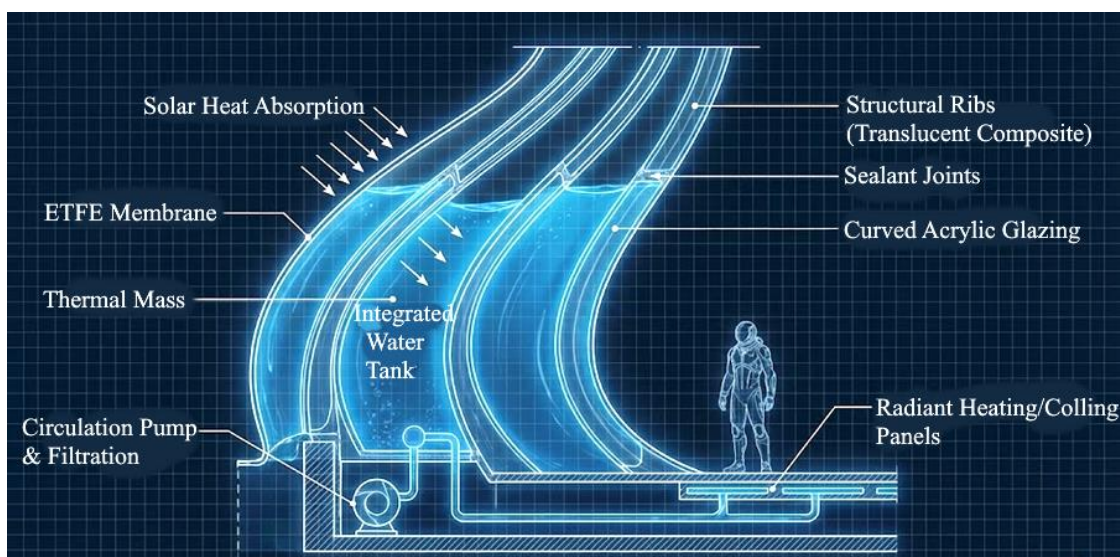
Technical section showing water-tank wall system in liquid architecture.
